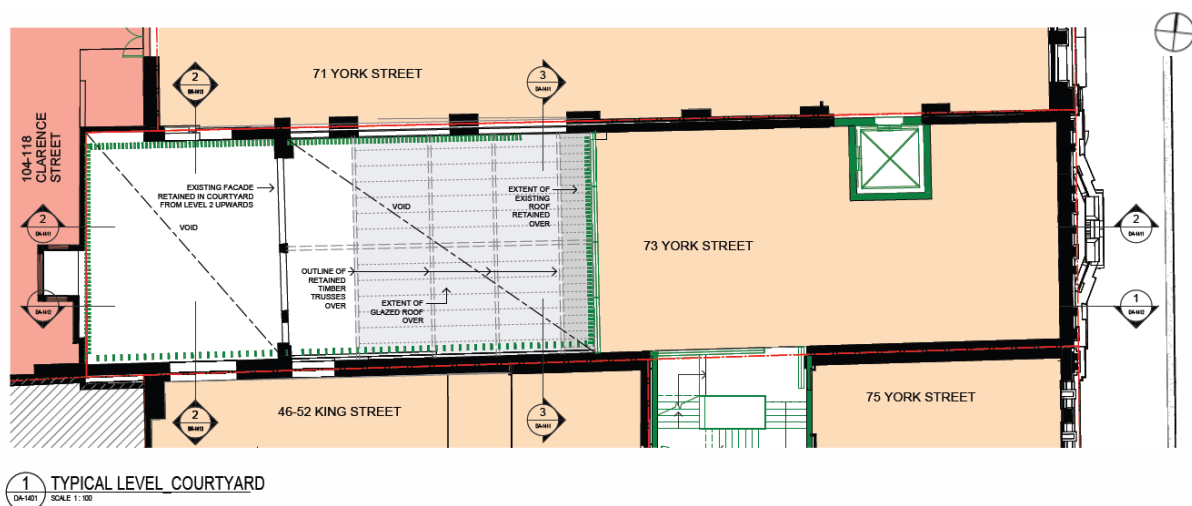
Detail showing extent of demolition within 73 York Street, retention of part of the rear facade and new glazed roof
